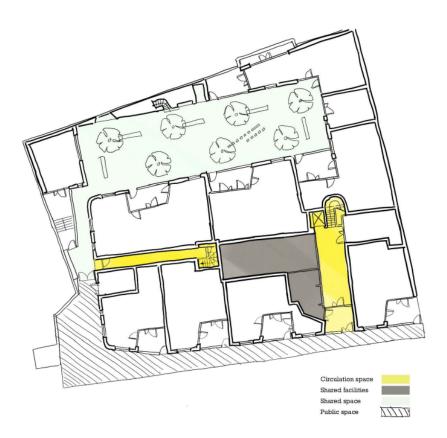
Sketchy ground floor plan of 95 Peckham Road
